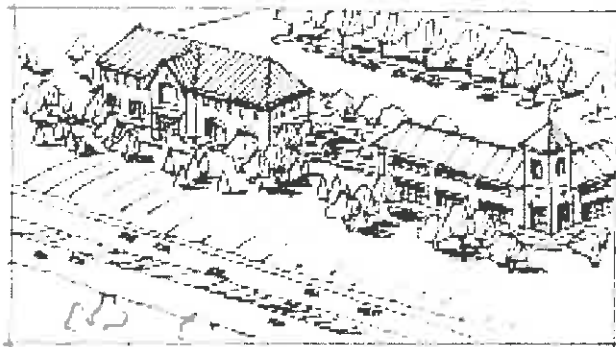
Buildings adjacent to I-25 should provide a landscaped setback of at least 25 feet.
